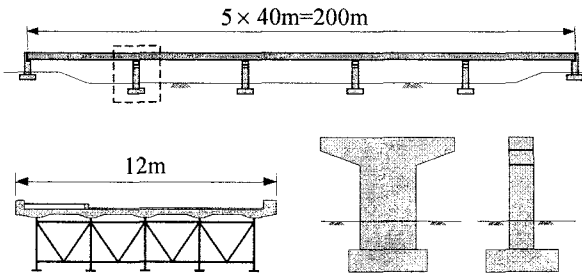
A continuous elevated highway bridge (a) elevation, (b) lateral view of superstructure, (c) lateral view of column, and (d) side view of column.
